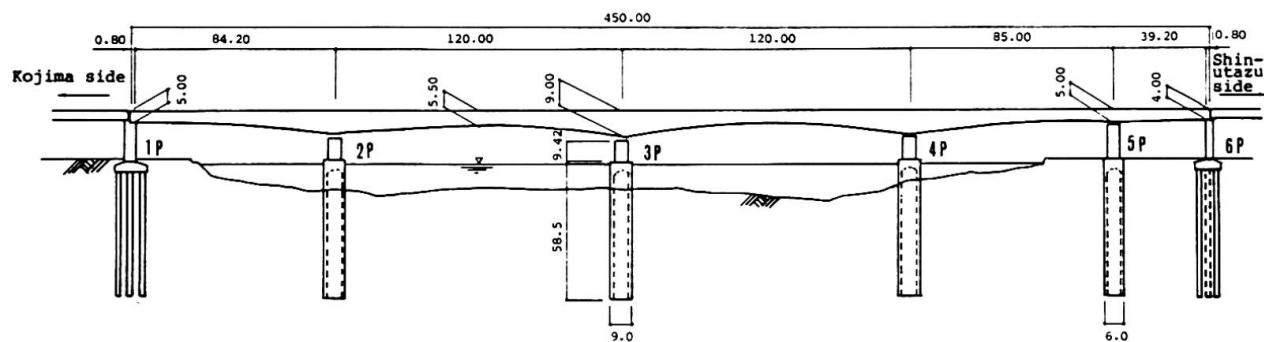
General drawing of the entire Kitaura-ko Bridge (m)
